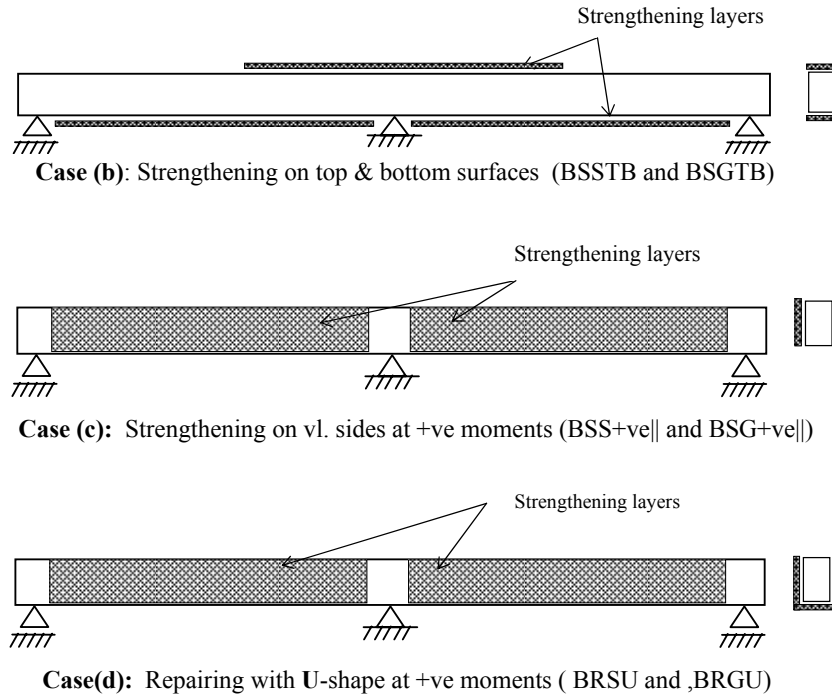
Strengthening schemes by steel plates and GFRP [7]
